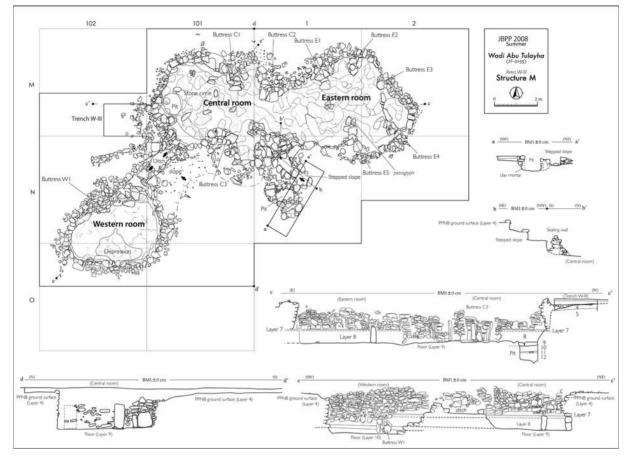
Wadi Abu Tulayha: plan and sections/elevations of the cistern (© S. Fujii).
